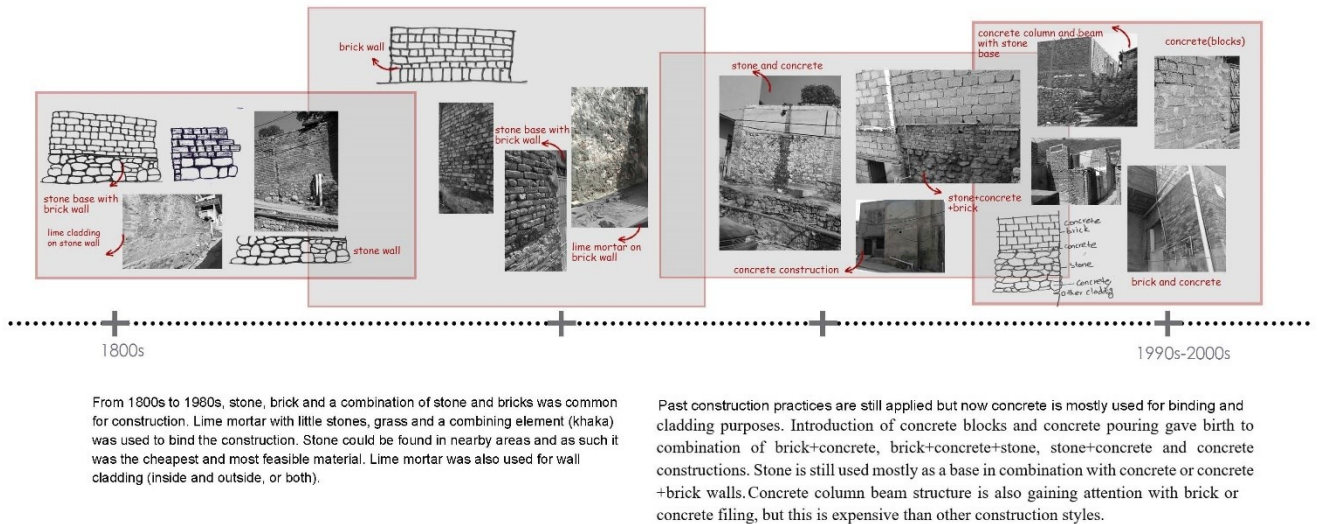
Wall constructions. (Source: Ramsha Nazir Malik)
